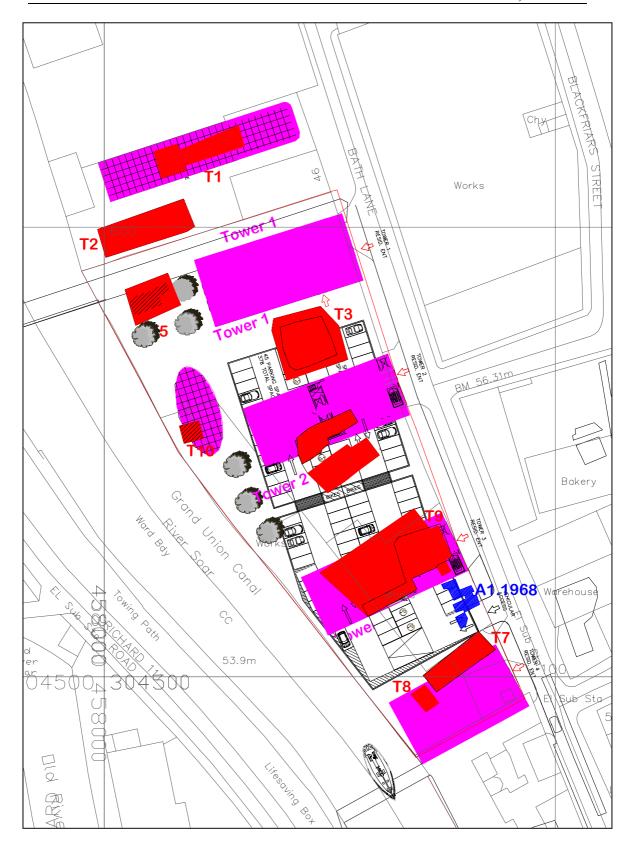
Evaluation trenches (red) overlaid on the development plans. Towers and buildings in magenta..
